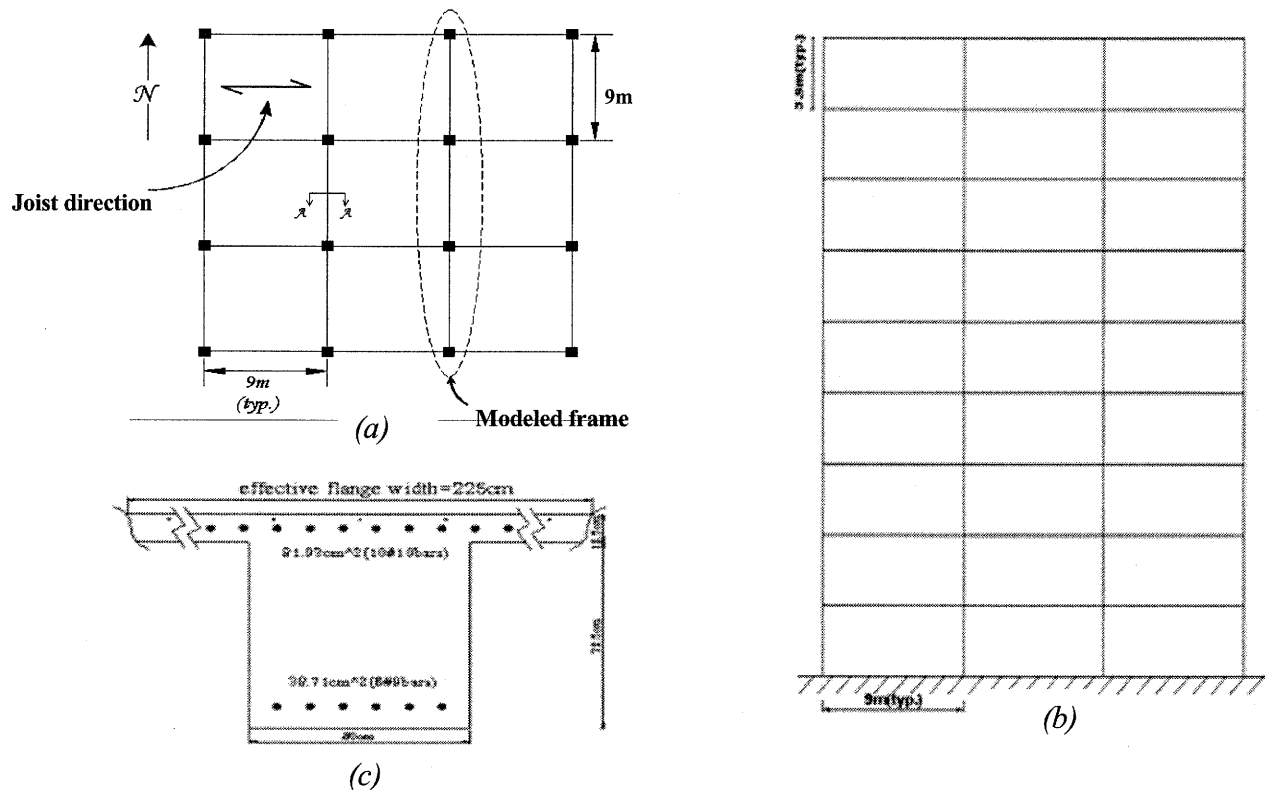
Details for nine story frame, (a) plan; (b) elevation; (c) beam cross section
